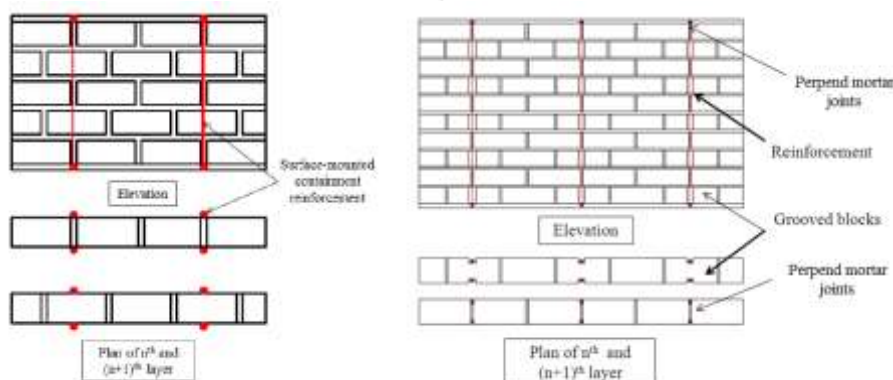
Surface mounted reinforcement and Fig.2 Near Surface mounted reinforcement.
